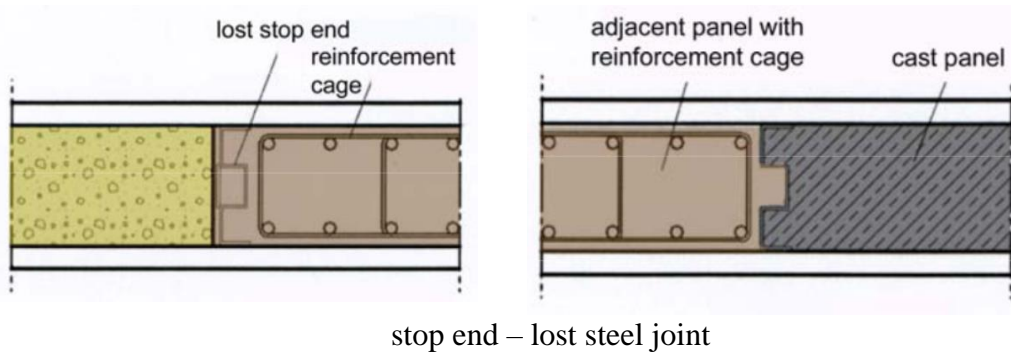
Some common joint elements in diaphragm walls (reprint from (Schneider, 2013)).
